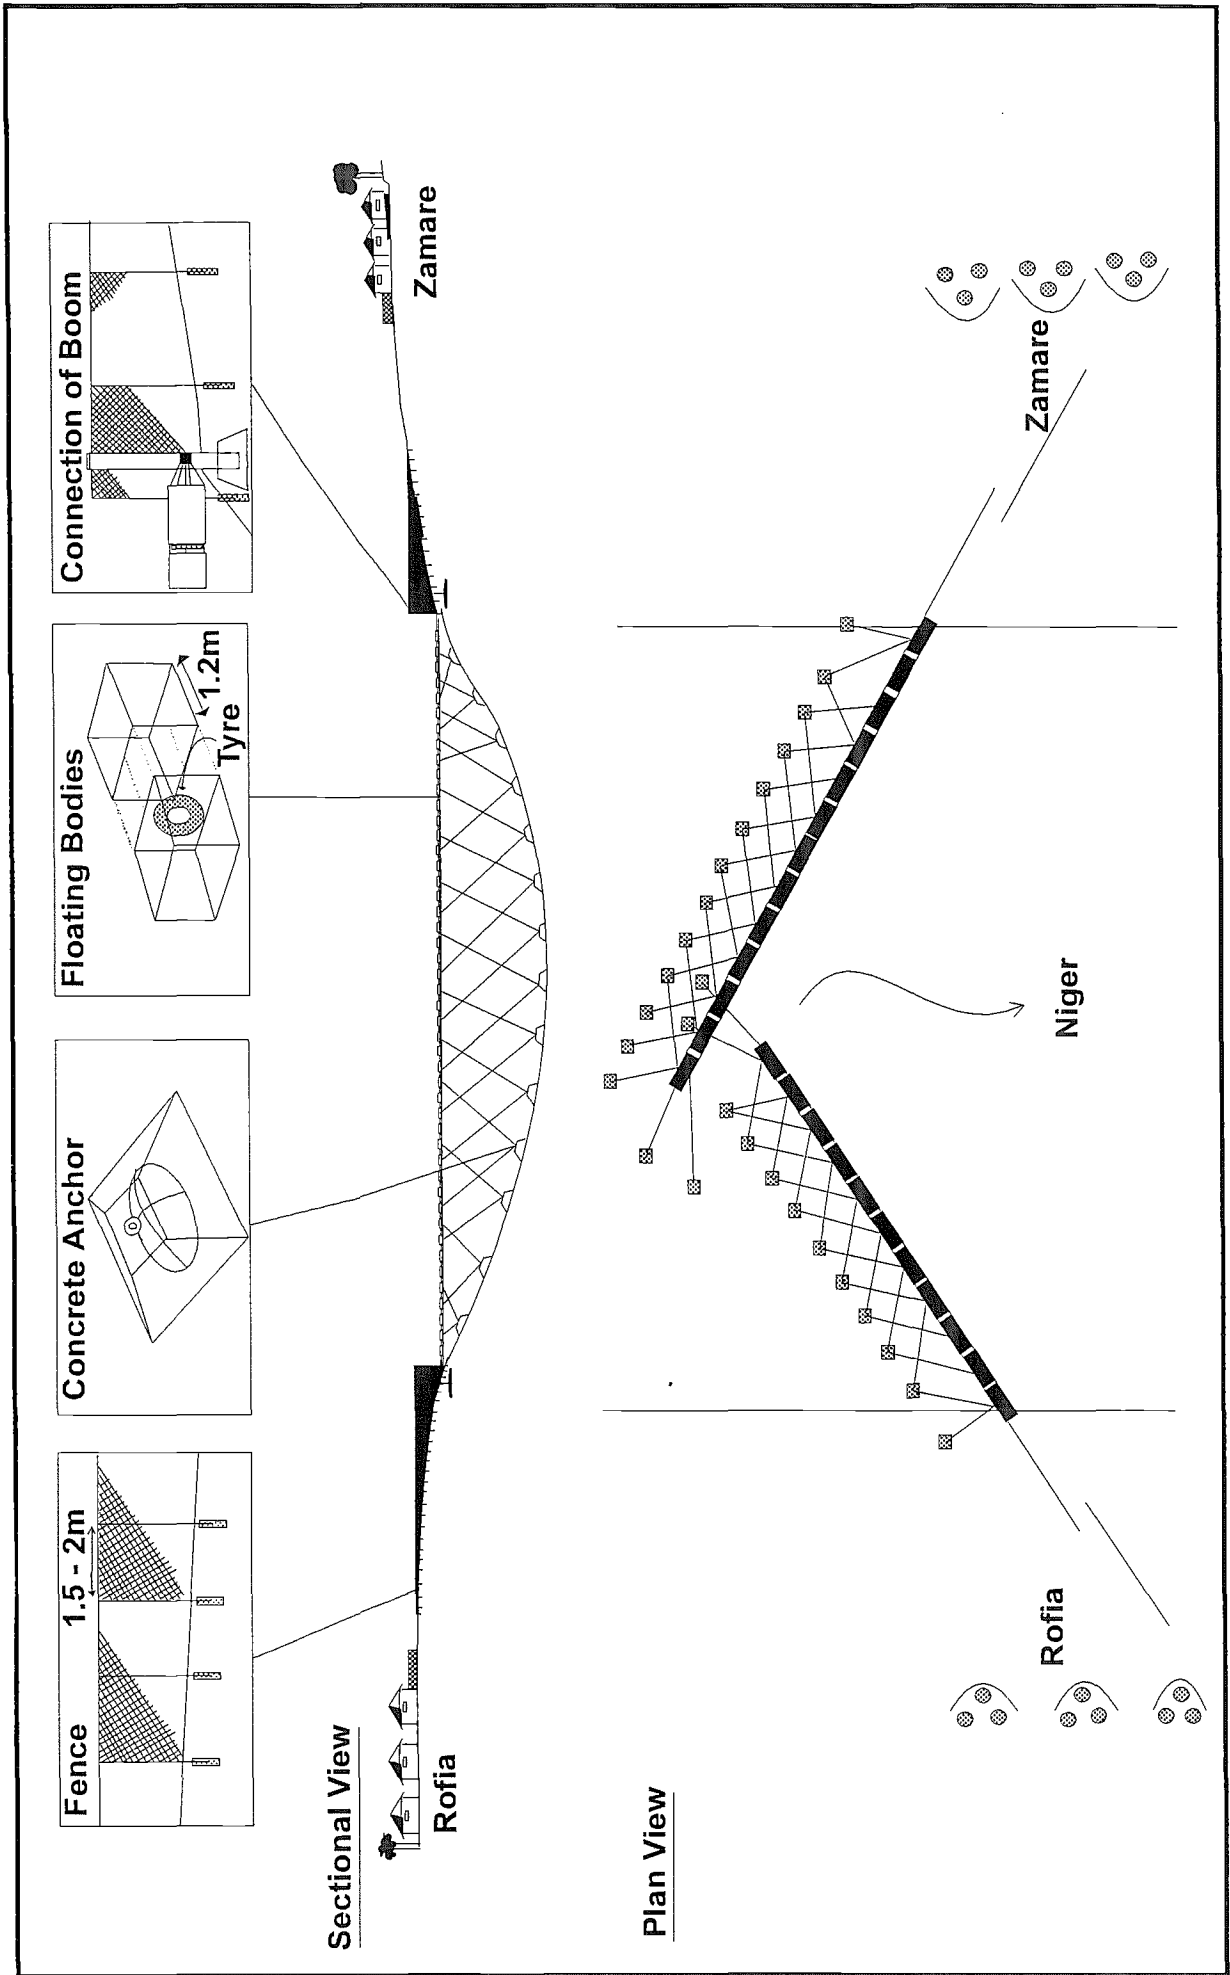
Sectional and Plan View of Water Hyacinth Barrier Between Rofia and Zamare on Kainji Lake
